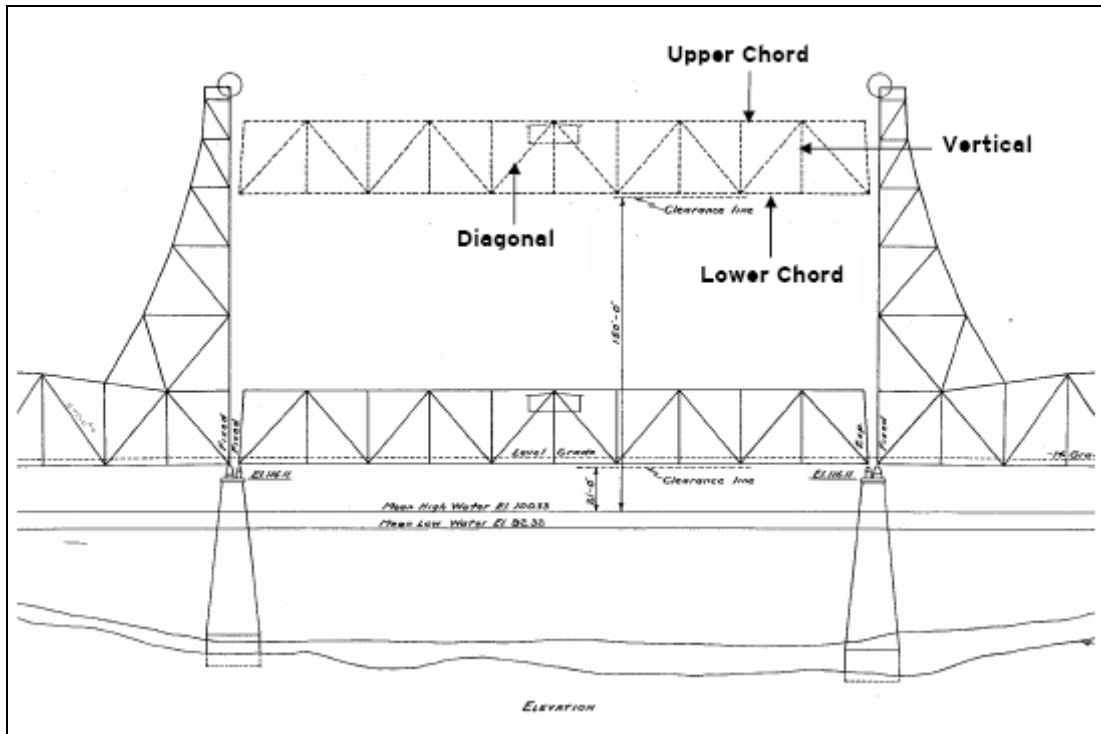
Elevation View of Lift Span Identifying Elements of the Truss System
